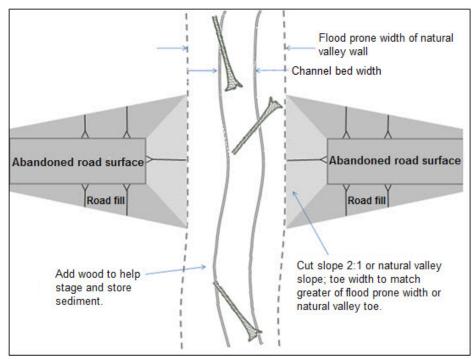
Plan view of road crossing abandonment showing excavation of road fill and placement of large wood when it is available on site and non-merchantable
